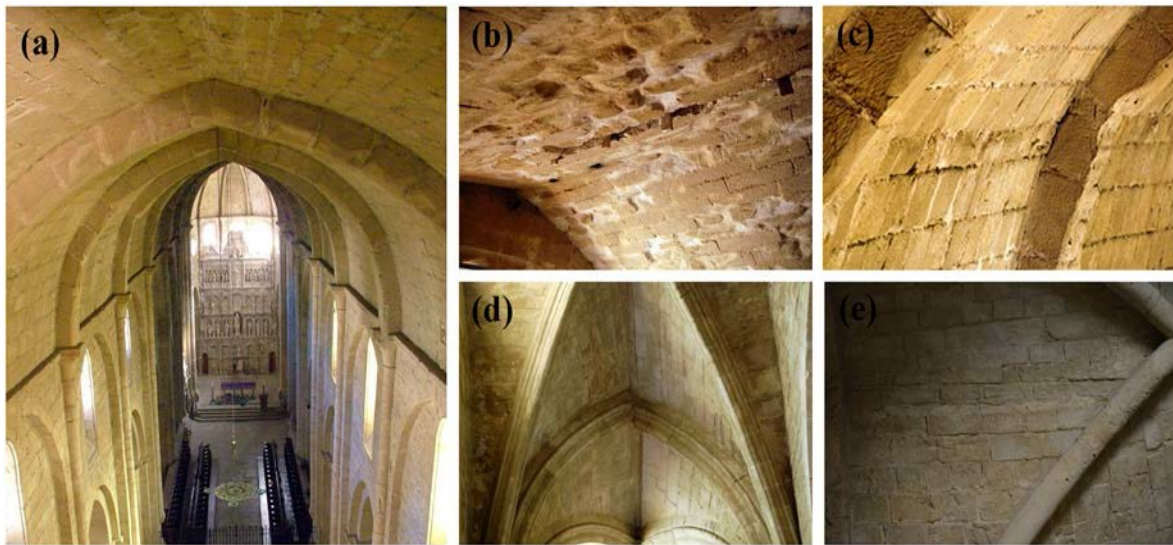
Deformation and damage in the main and lateral aisles of the church: (a) deformation in the arches and barrel vault of the main nave, (b) cracking in the barrel vault, (c) crushing in the arches of the main nave, (d) cracking in the vault of the southern aisle, and (e) repaired cracking in the vault of the northern aisle.
